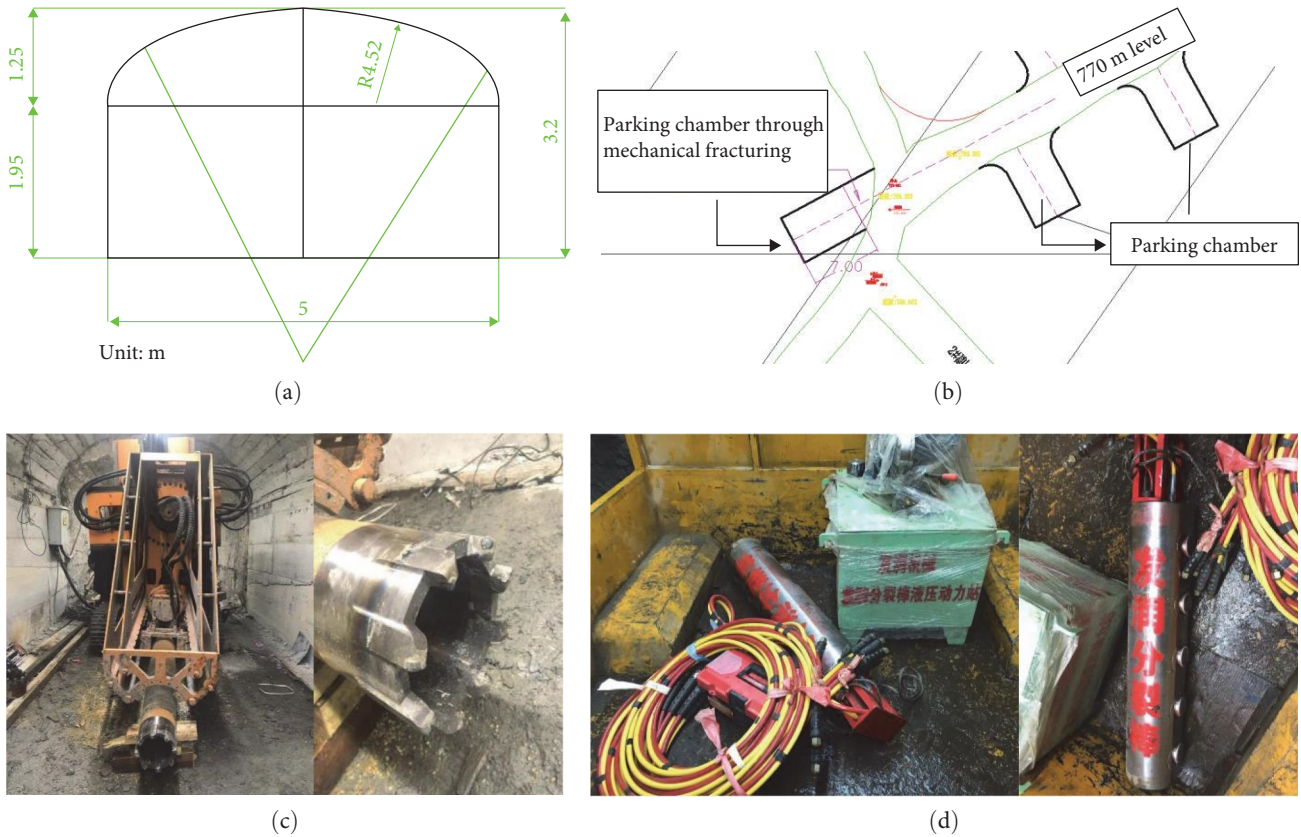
Application test of mechanical fracturing roadway excavation: (a) cross-section of parking chamber; (b) parking chamber location; (c) core drilling rig; and (d) piston splitter.
